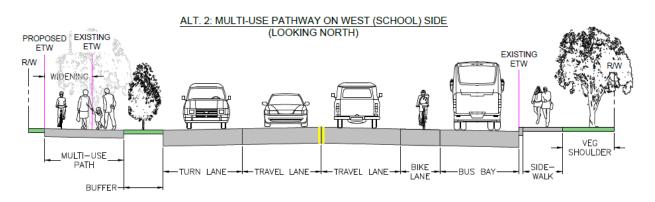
Ringwood Avenue Alternative 2 Near MAHS
